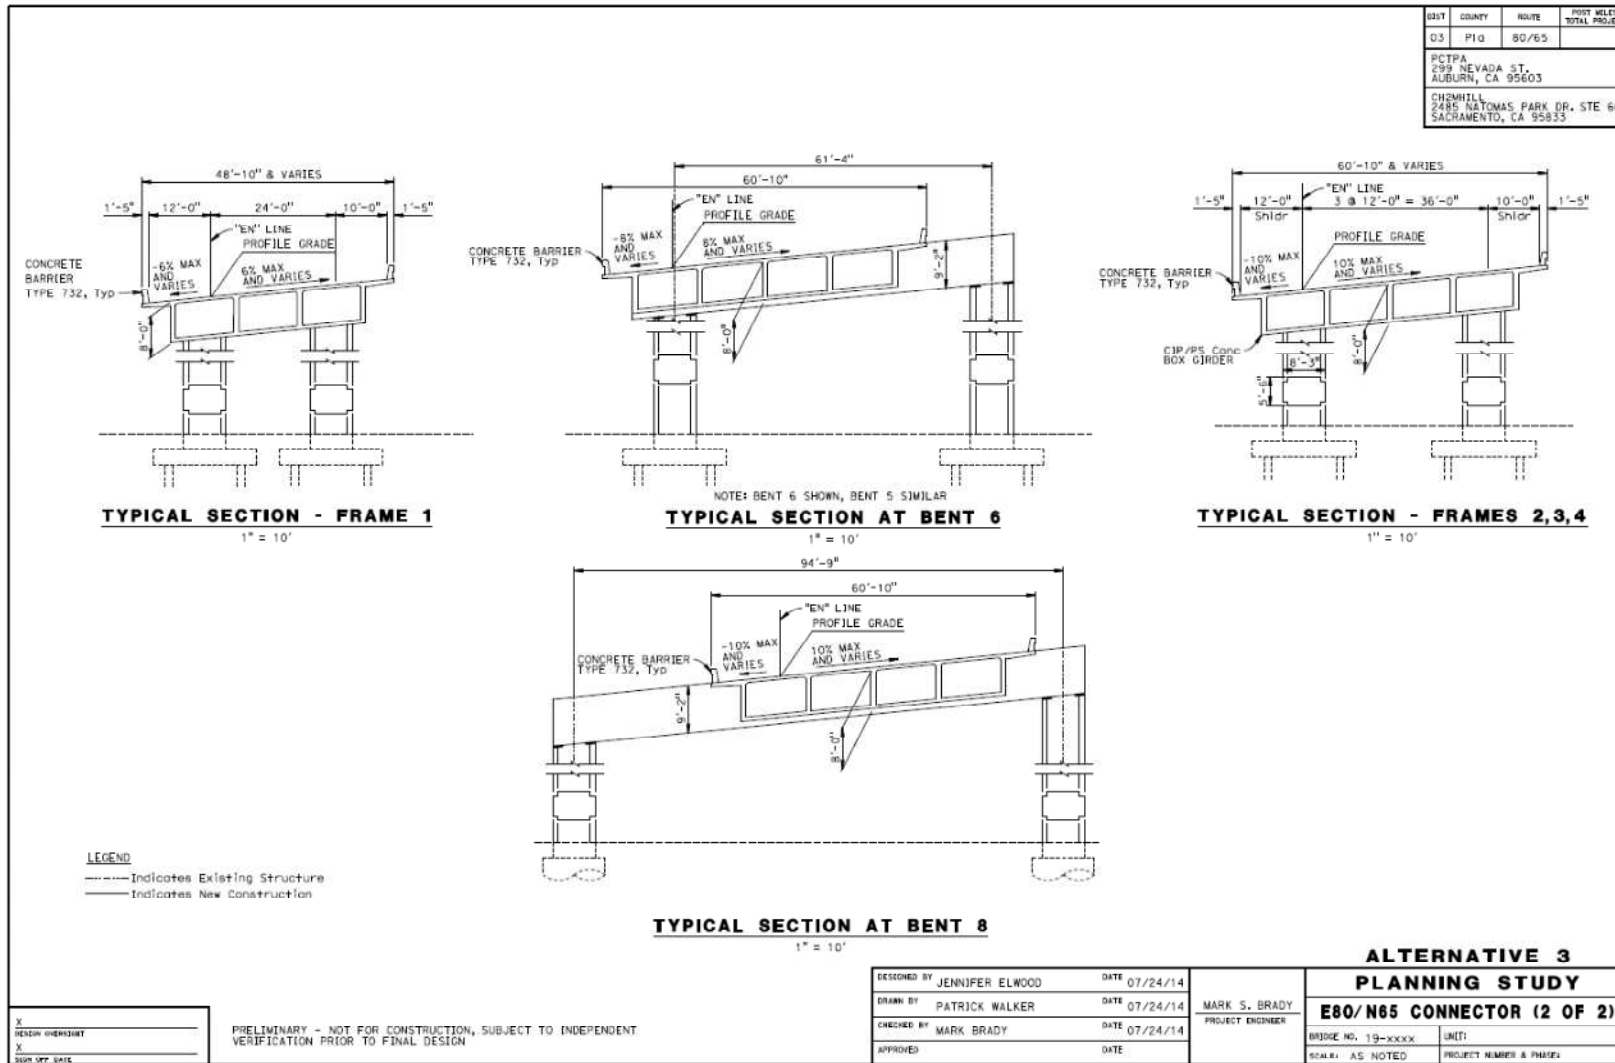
Proposed EN Connector Plan (Alternative 3) (2 of 2)
